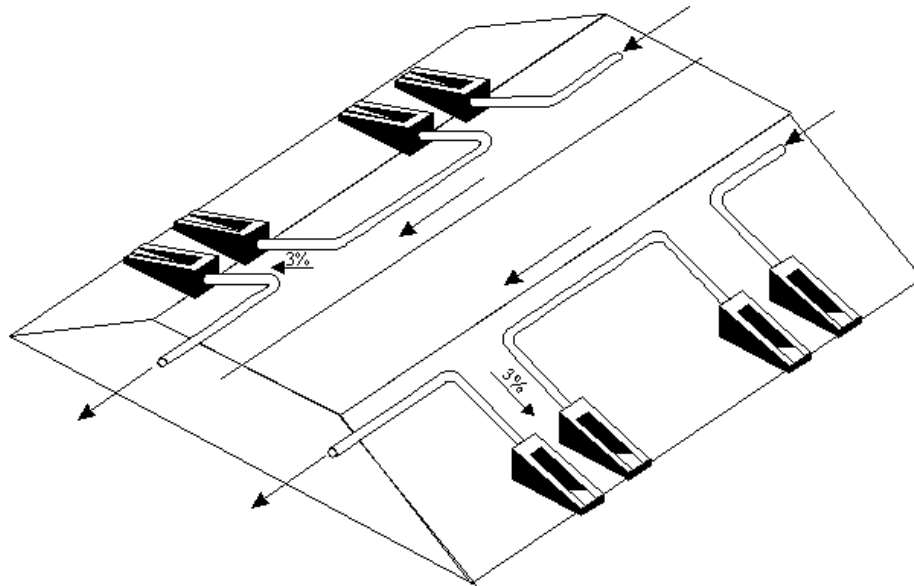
Schematic of dual outlet system layout (Baumgardner 1998).
